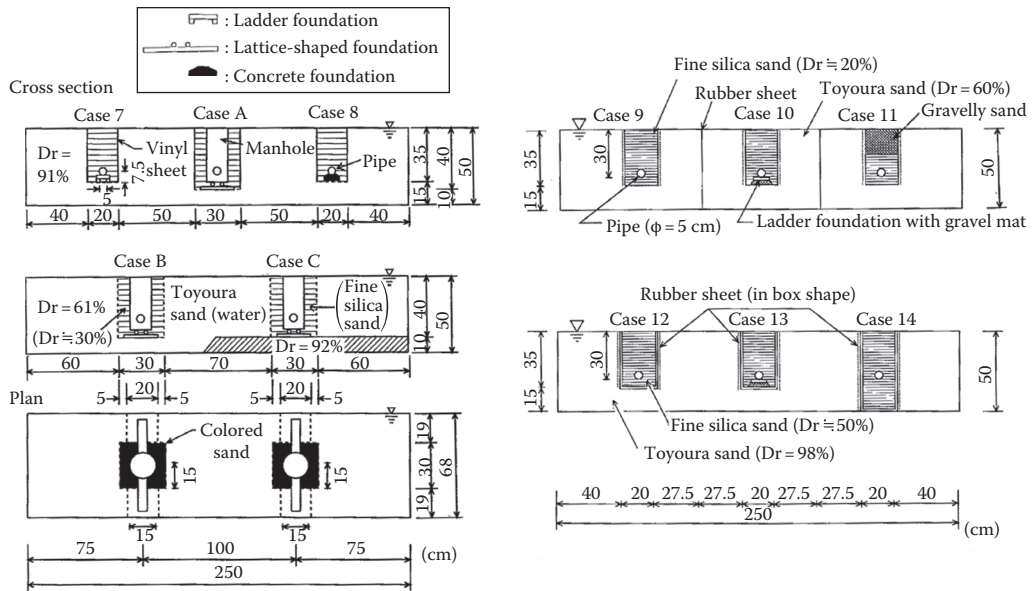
Model of sewer pipes and manholes. (From Koseki, J. et al., *Soils Found.*, 38(3), 75, 1998.)
